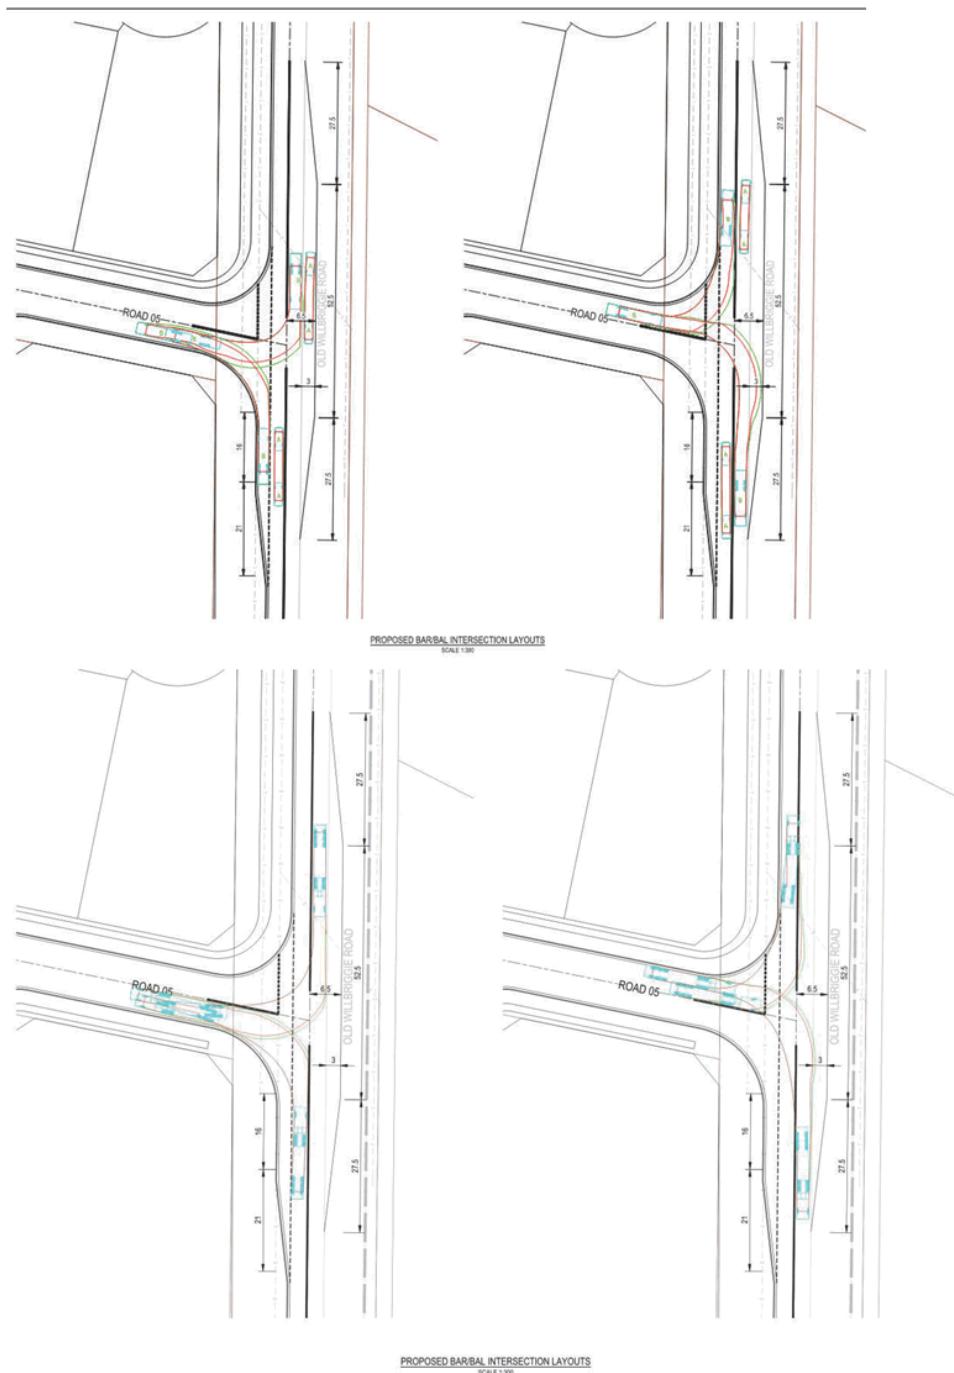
Proposed intersection of Old Willbriggie Road and Road 05 in Stage 1
